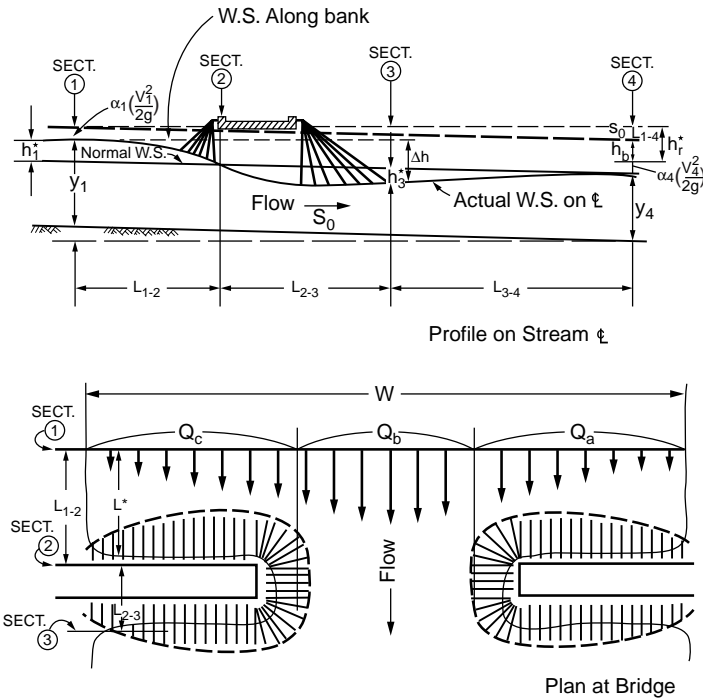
Normal bridge crossing with spillthrough abutments. (Source: Bradley, 1978, *Hydraulics of Bridges*, FIGURE 3 p. 7, Hydraulic Series No.1, Federal Highway Administration.)
